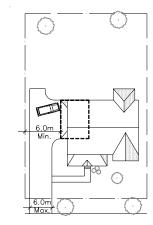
Side Facing Garage Incorporated into the Massing of the Dwelling
